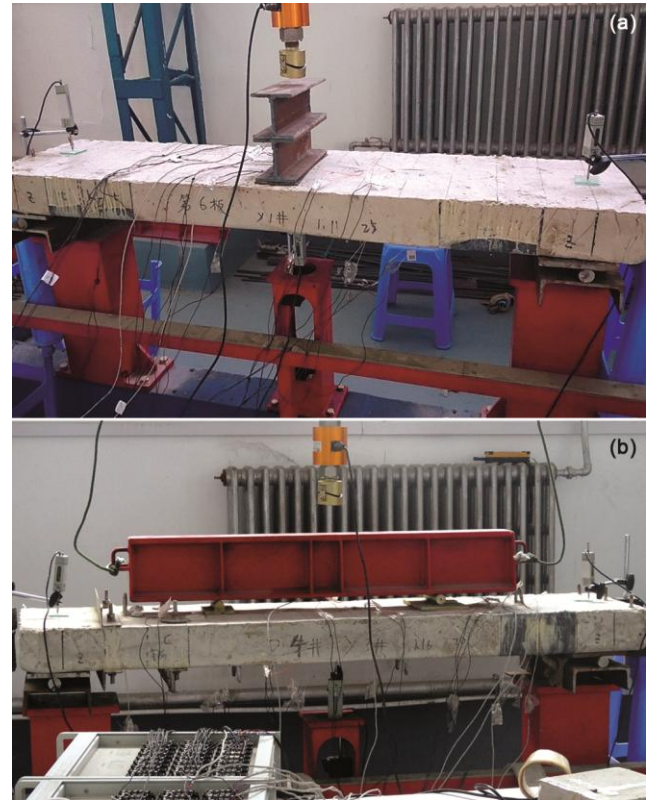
Slab specimen loading apparatus (a) Midspan single-point loading and (b) Third-point symmetric loading.
